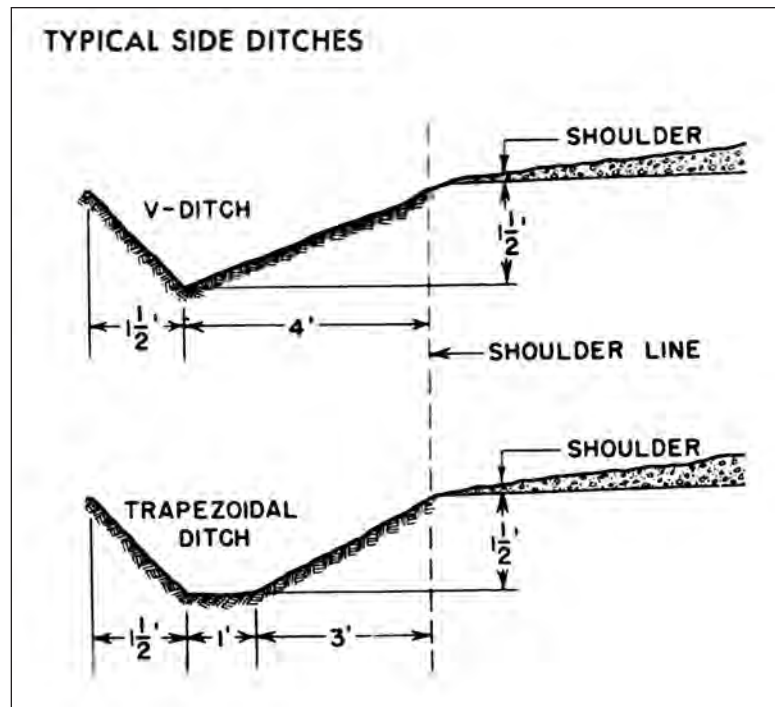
Typical cross section of a road-side ditch. From War Department 1947:135.
